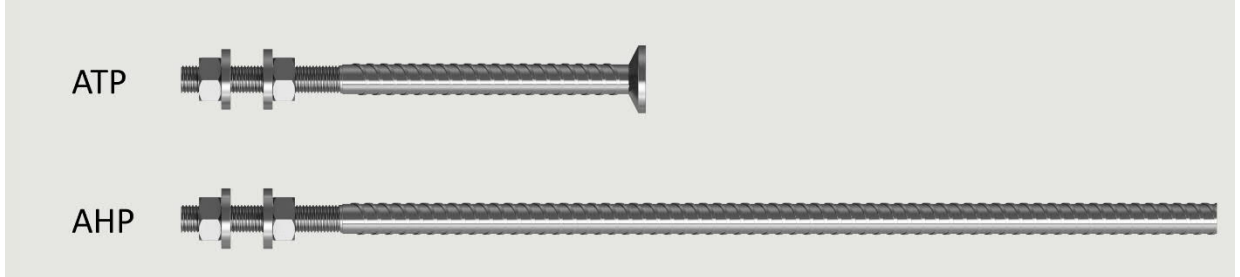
ATP® bolt with headed fastened anchor and AHP® bolt with rebar bond
